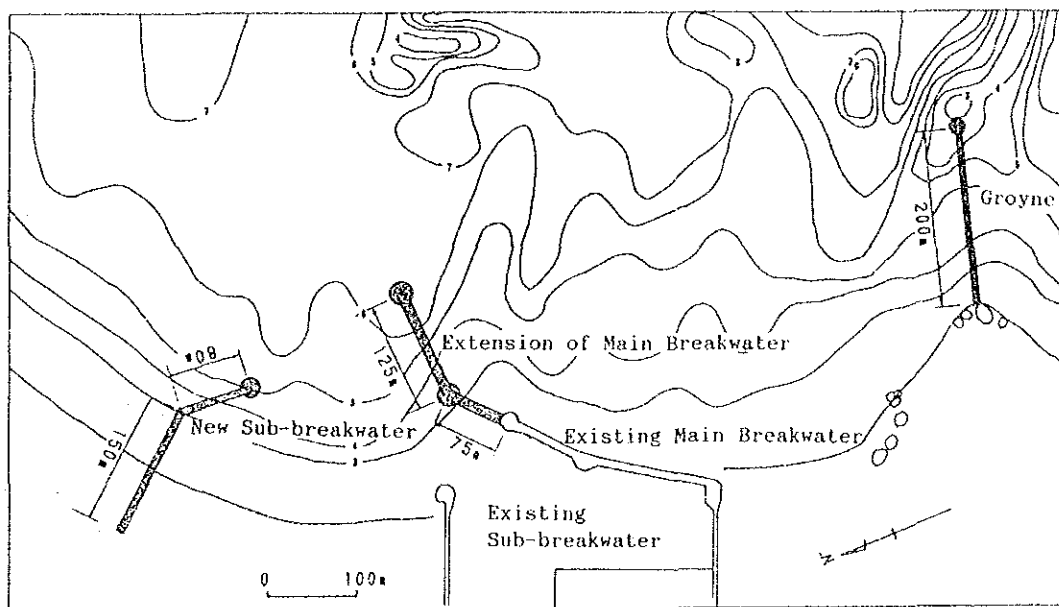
Arrangement of Breakwaters (Case-11)
